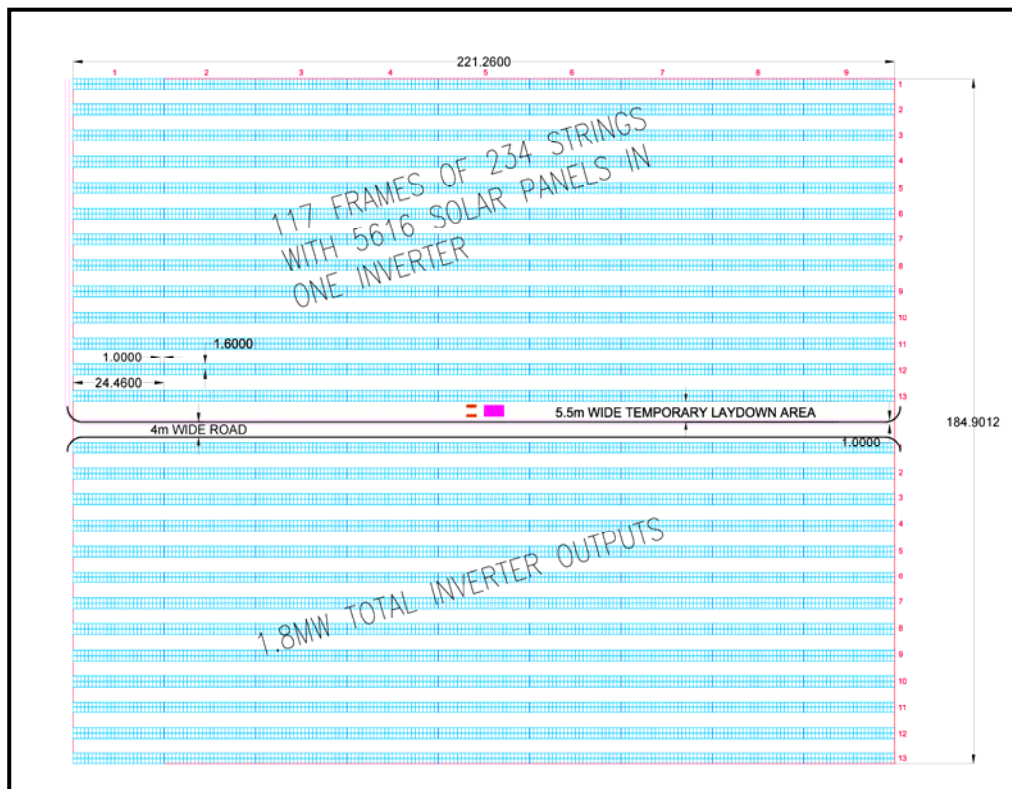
Block layout of layout alternative 1, fixed solar panels (Drawing number P8801 - ELE - DET - 01 - SHT1 - PRE - 00, Appendix G)
